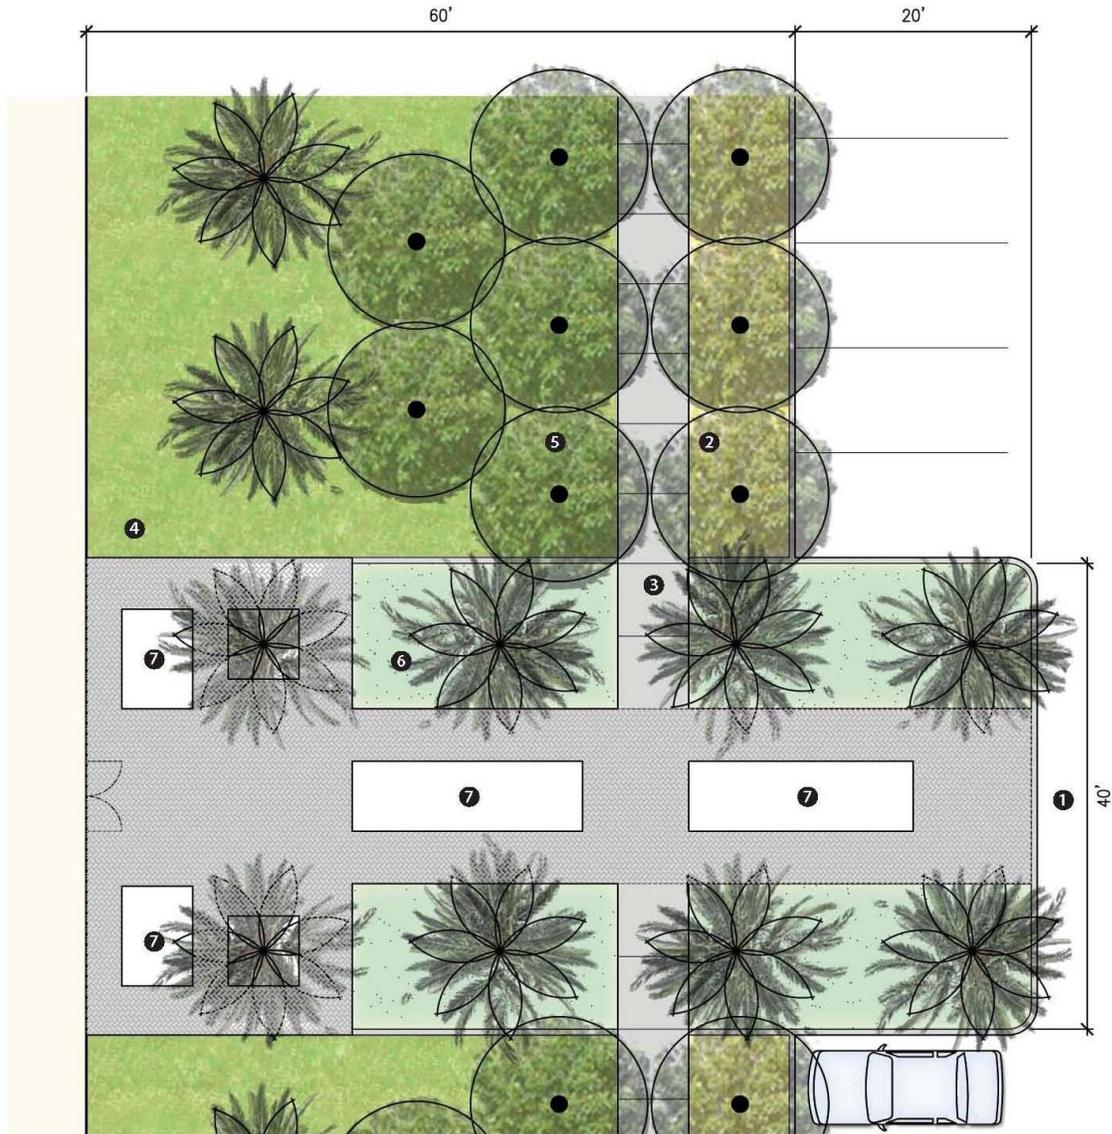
3-4 Story Office Building Front Facade Landscape Plan
